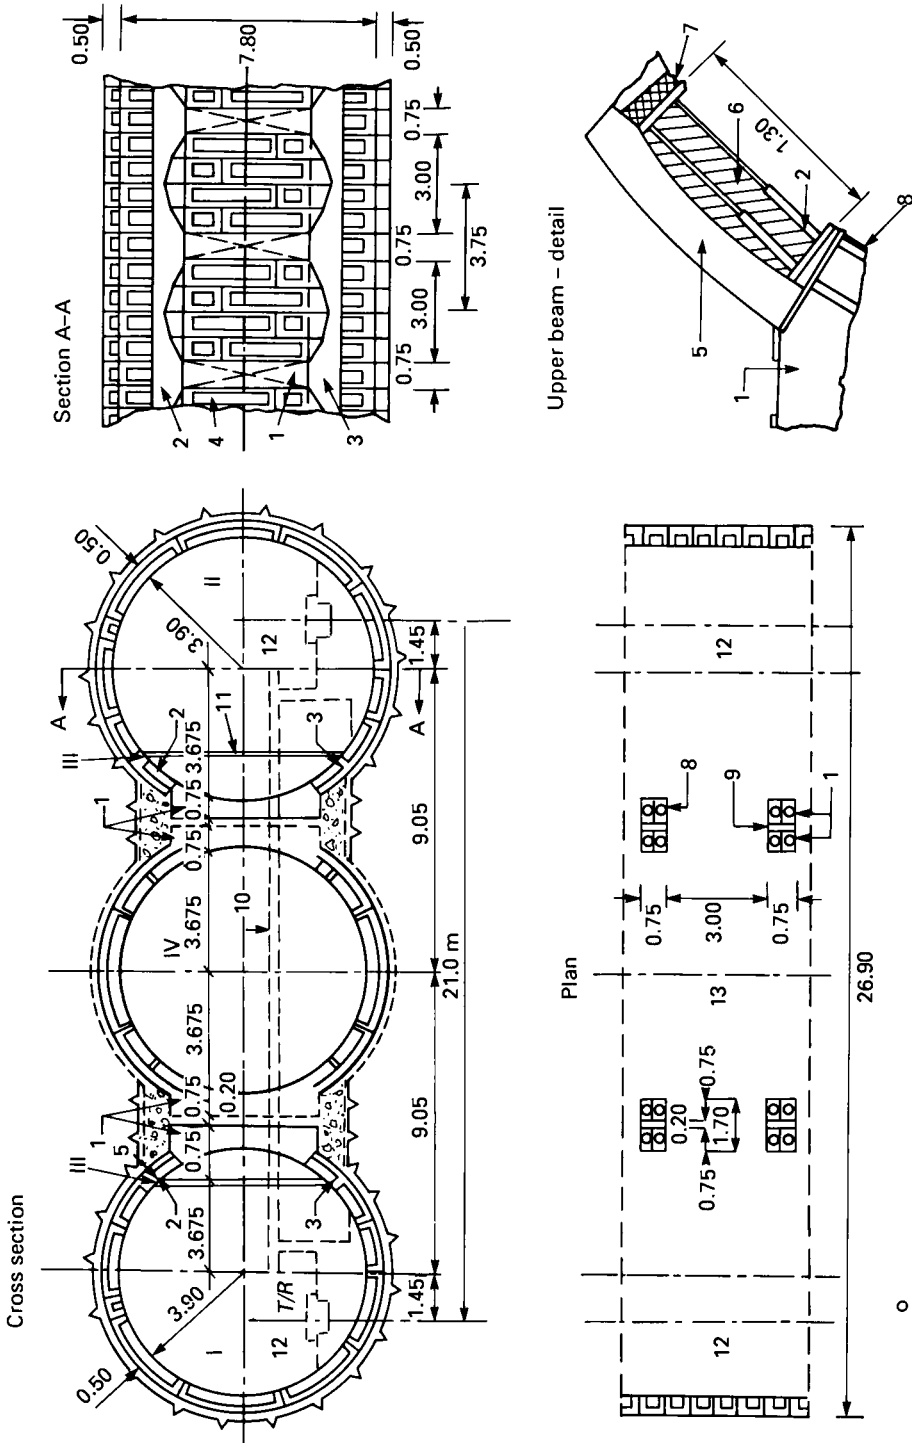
Station with three tunnels connected (Prague). 1, RC pillar; 2, welded steel beam (upper); 3, welded steel beam (lower); 4, temporary filling segments; 5, precast RC tunnel lining segment (bolted); 6, concrete filling; 7, steel fibre concrete; 8, steel pipes of 324 mm diameter and wall thickness of 36 mm as rigid reinforcement; 9, grouting; 10, platform level; 11, temporary struts; 12, track centreline; 13, station centreline. Sequence of operations: I, Driving the first outer tunnel; II, driving the second outer tunnel; III, placing the steel beams; IV, driving the central tunnel
